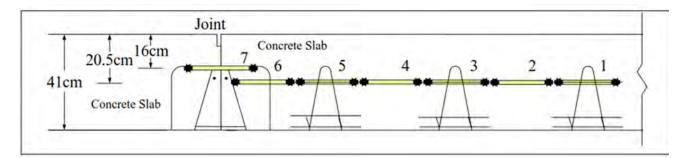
Cross section of fibre optic sensor installation in a concrete pavement [35]
